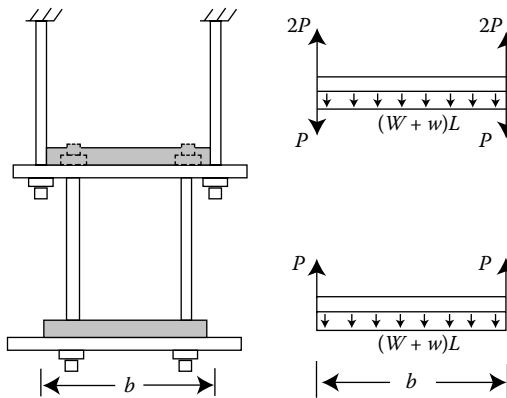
Extending the model of the walkways and their supports to reflect the redesign. An end view of the second- and fourth-floor walkways designed so that the second-floor walkway hangs from the fourth-floor supporting beams, and FBDs of a typical pair of supports. Note that the forces supported by the hanger rods are unchanged from the original design.
